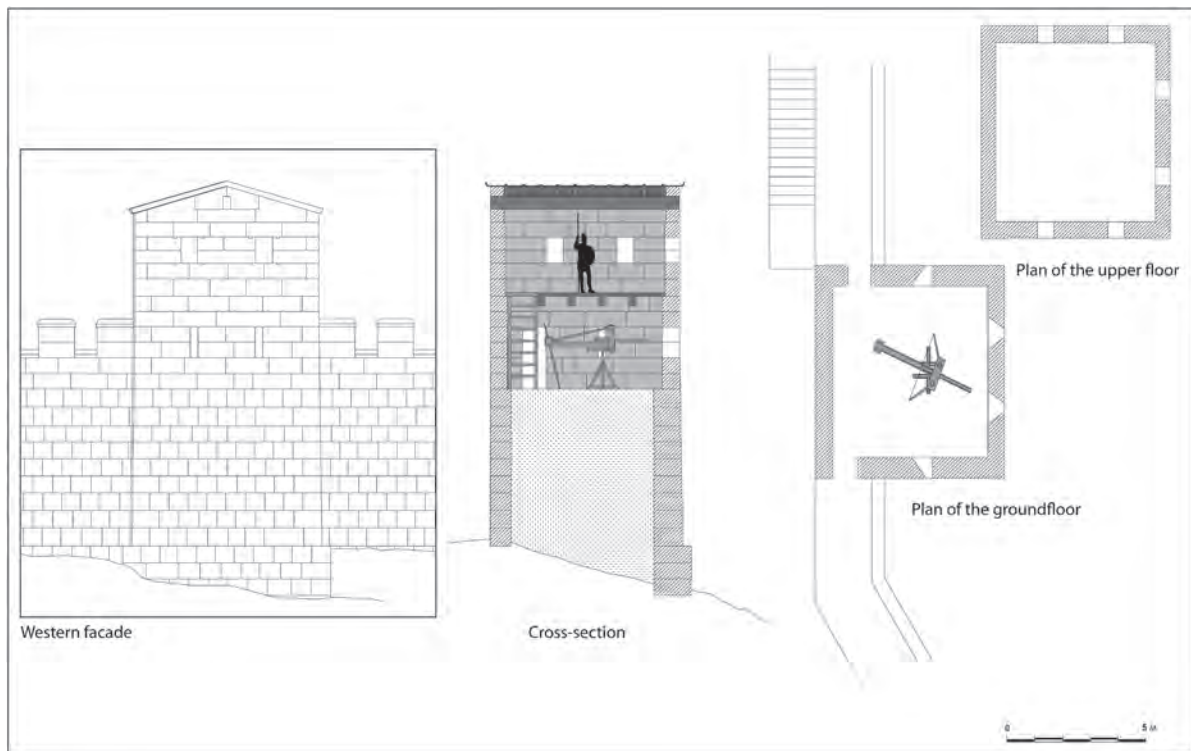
Reconstructed plan of Tower M (drawing by the author).
